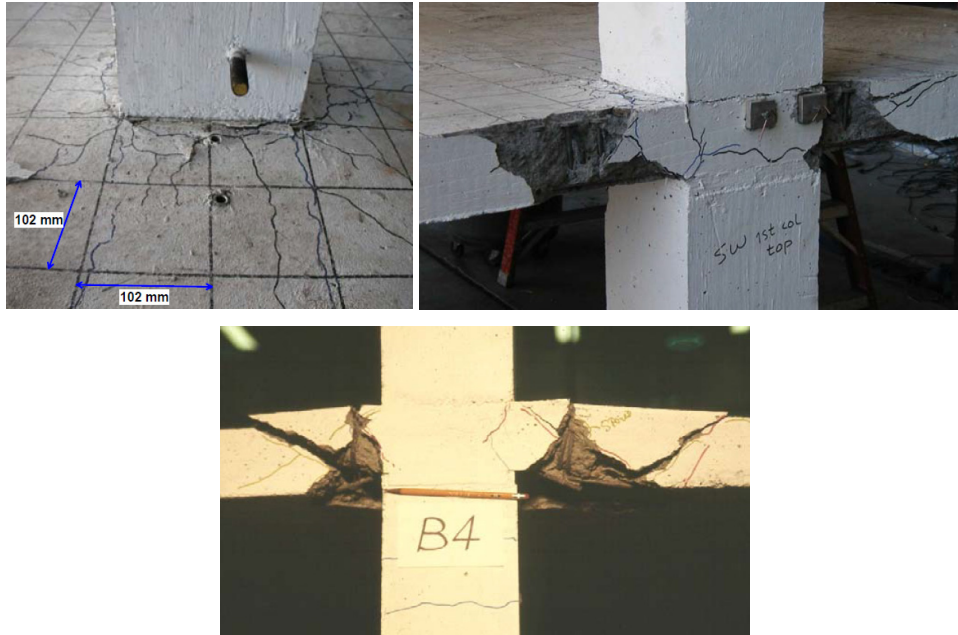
Slab damage a) and b) with shear reinforcement, Kang and Wallace, 2004 [5] c) without shear reinforcement, Hwang and Moehle, 1993 [1].
